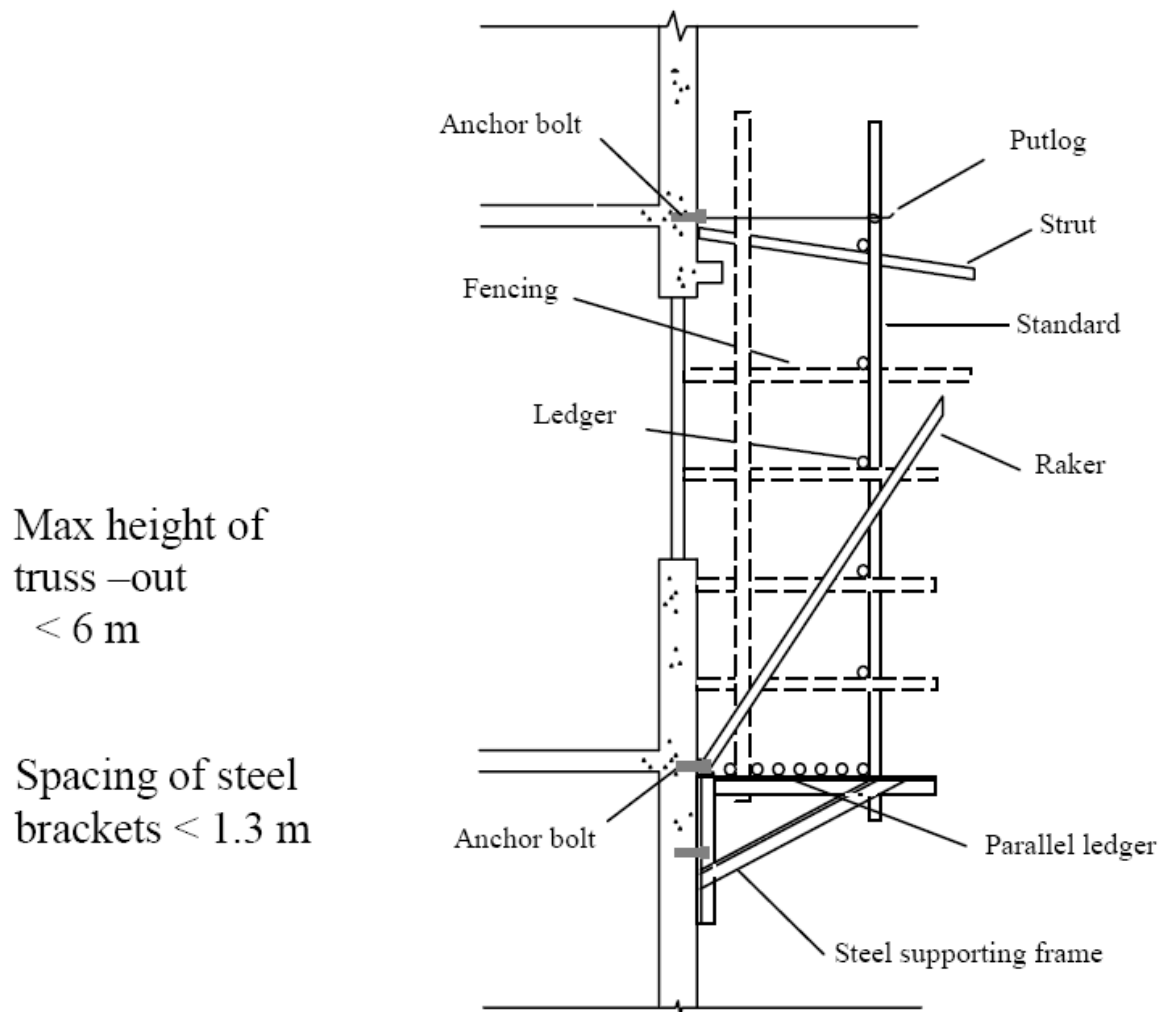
Truss-out bamboo scaffold (Adopted from Buildings Department, 2006).
